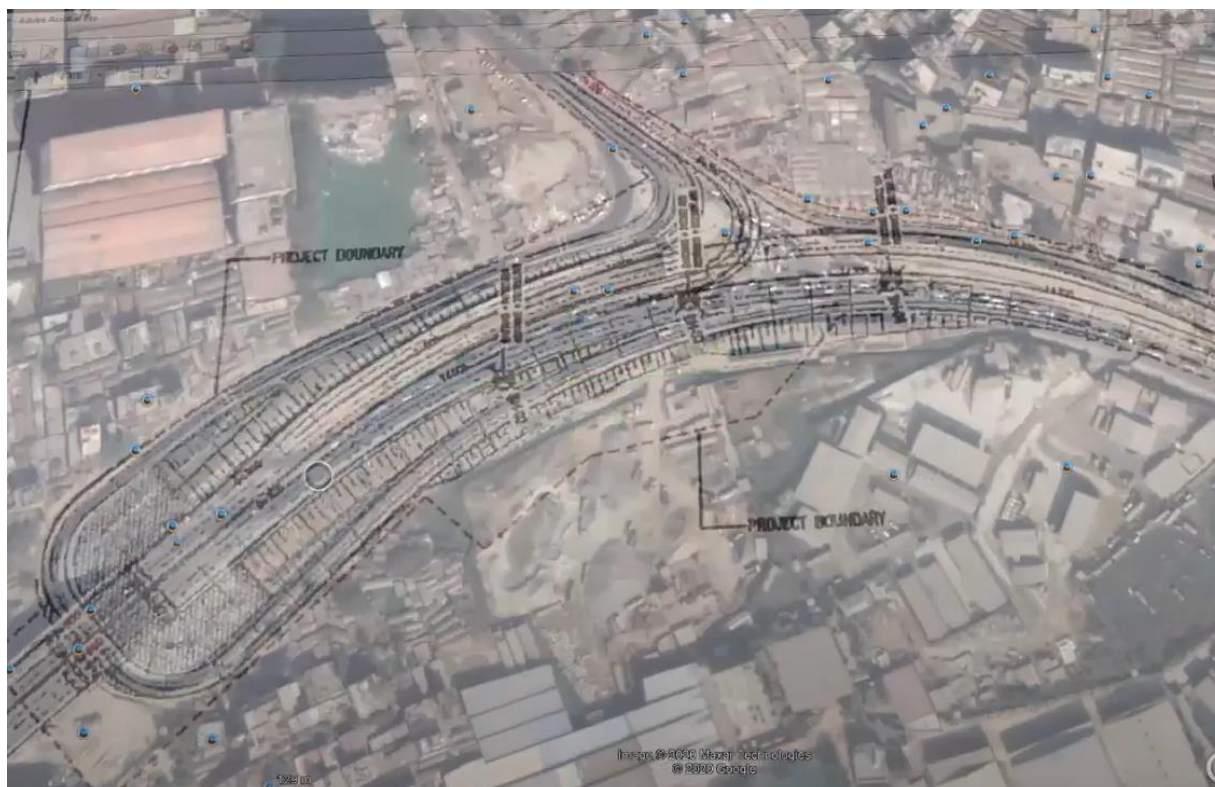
a : Clear map of Kanchpur, Meghna, Gumti 2nd Bridges Construction and Reconstruction of Existing overlay on the map
